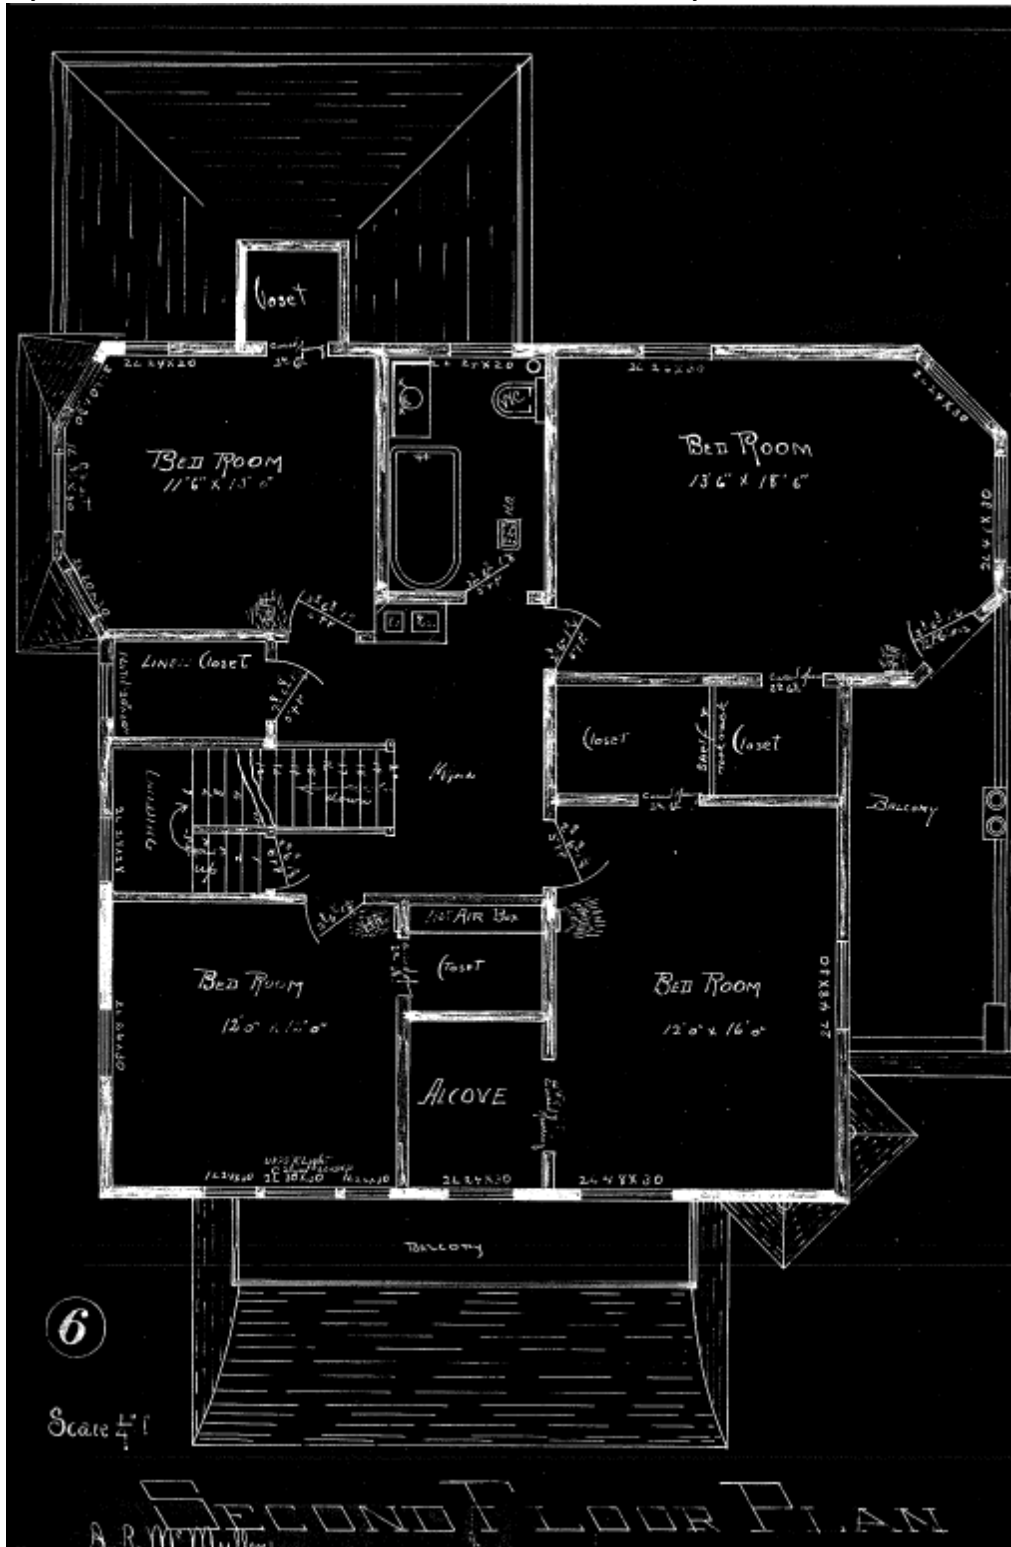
Second Floor Plan, Moses N. Bair, 1904. The plan was modified after this drawing was completed, as the closet opening to the northwest bedroom was never constructed.
